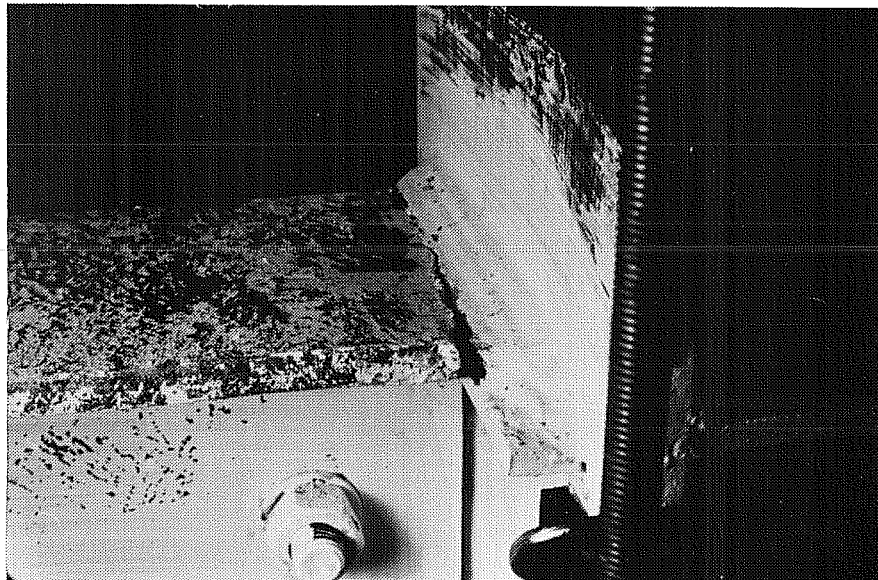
Top Flange Failure in Specimen 7
